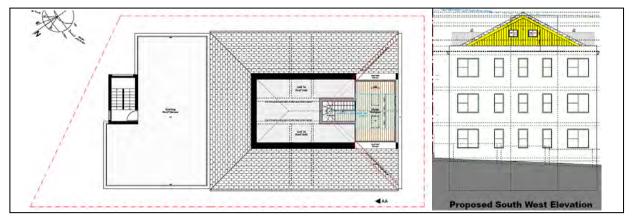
Plans submitted for PD-23/2022. (Source: iSA Designs, 2012)
